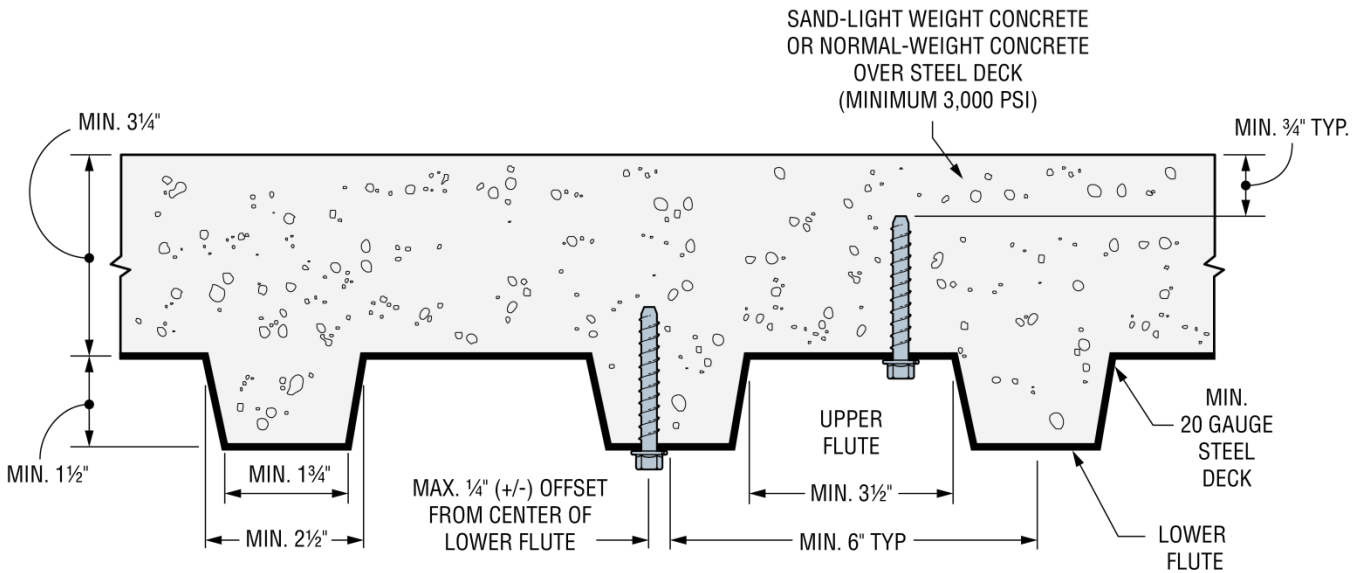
INSTALLATION OF 1/4-INCH SHANK DIAMETER SCREW ANCHORS AND ROD HANGERS INTO THE SOFFIT OF CONCRETE-FILLED PROFILE STEEL DECK FLOOR AND ROOF ASSEMBLIES (1 in = 25.4 mm)
